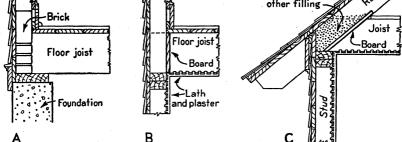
Method of stopping drafts in walls: A, at first floor; B, at second floor; C, at attic floor
